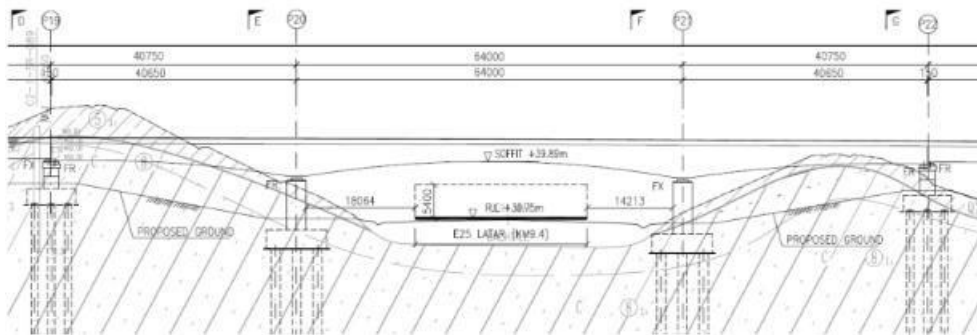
The drawing shows the Bridge 18 design crossing LATAR
